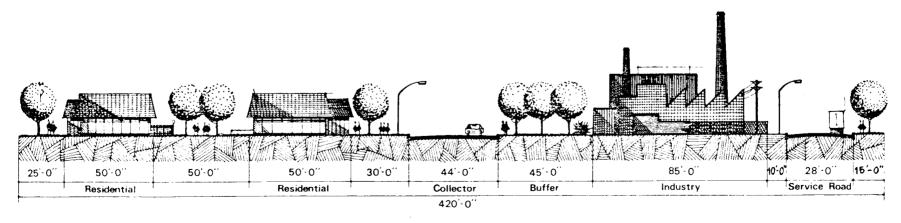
TYPICAL SECTION--PLANNED INDUSTRIAL DEVELOPMENT
